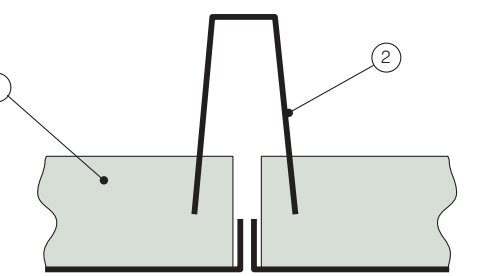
OMEGA HS 55 carrier in cross section. PLANK END ALIGNMENT.
